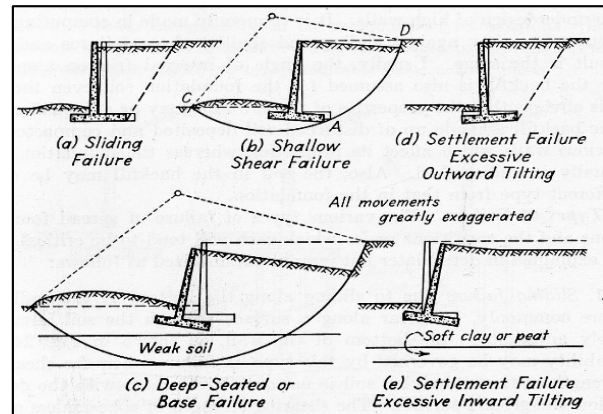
Failure modes for cantilevered sheet pile walls [5]
